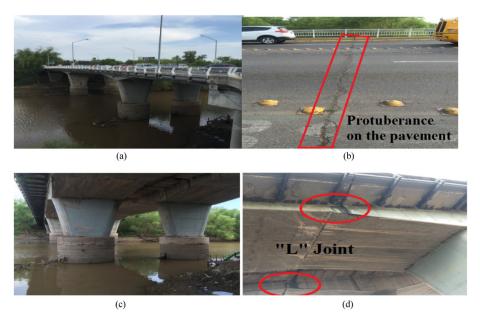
Dimension and condition of the Juarez Bridge. (a) - longitudinal view; (b) - top view (protuberance on pavement); (c) - piers condition; (d) - joint of mid span.
